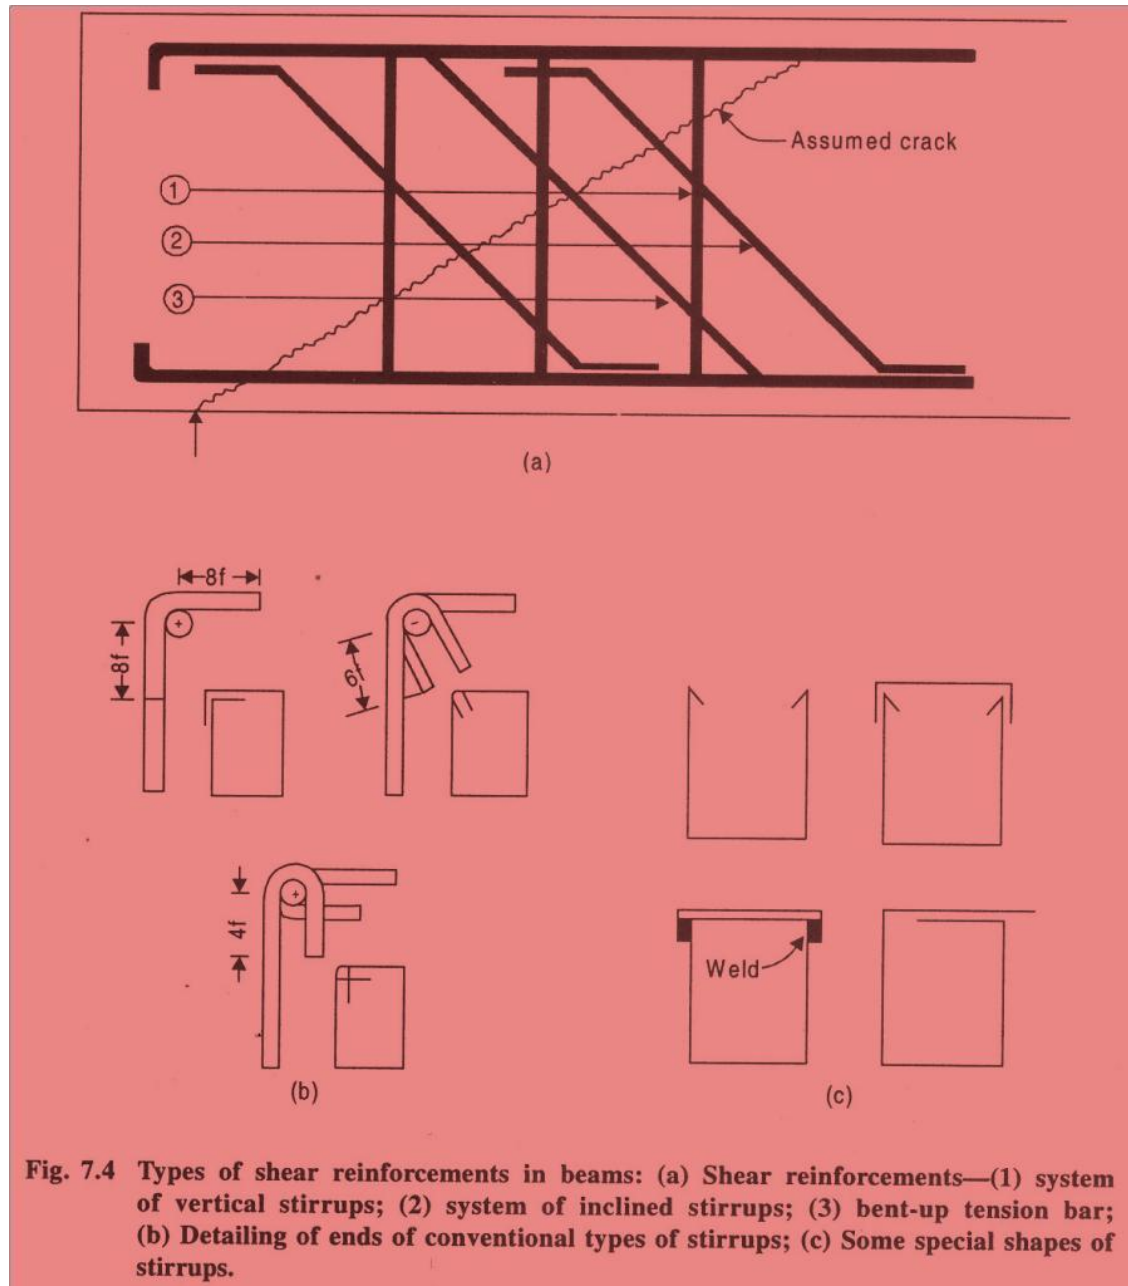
Types of shear reinforcements in beams: (a) Shear reinforcements—(1) system of vertical stirrups; (2) system of inclined stirrups; (3) bent-up tension bar; (b) Detailing of ends of conventional types of stirrups; (c) Some special shapes of stirrups.
